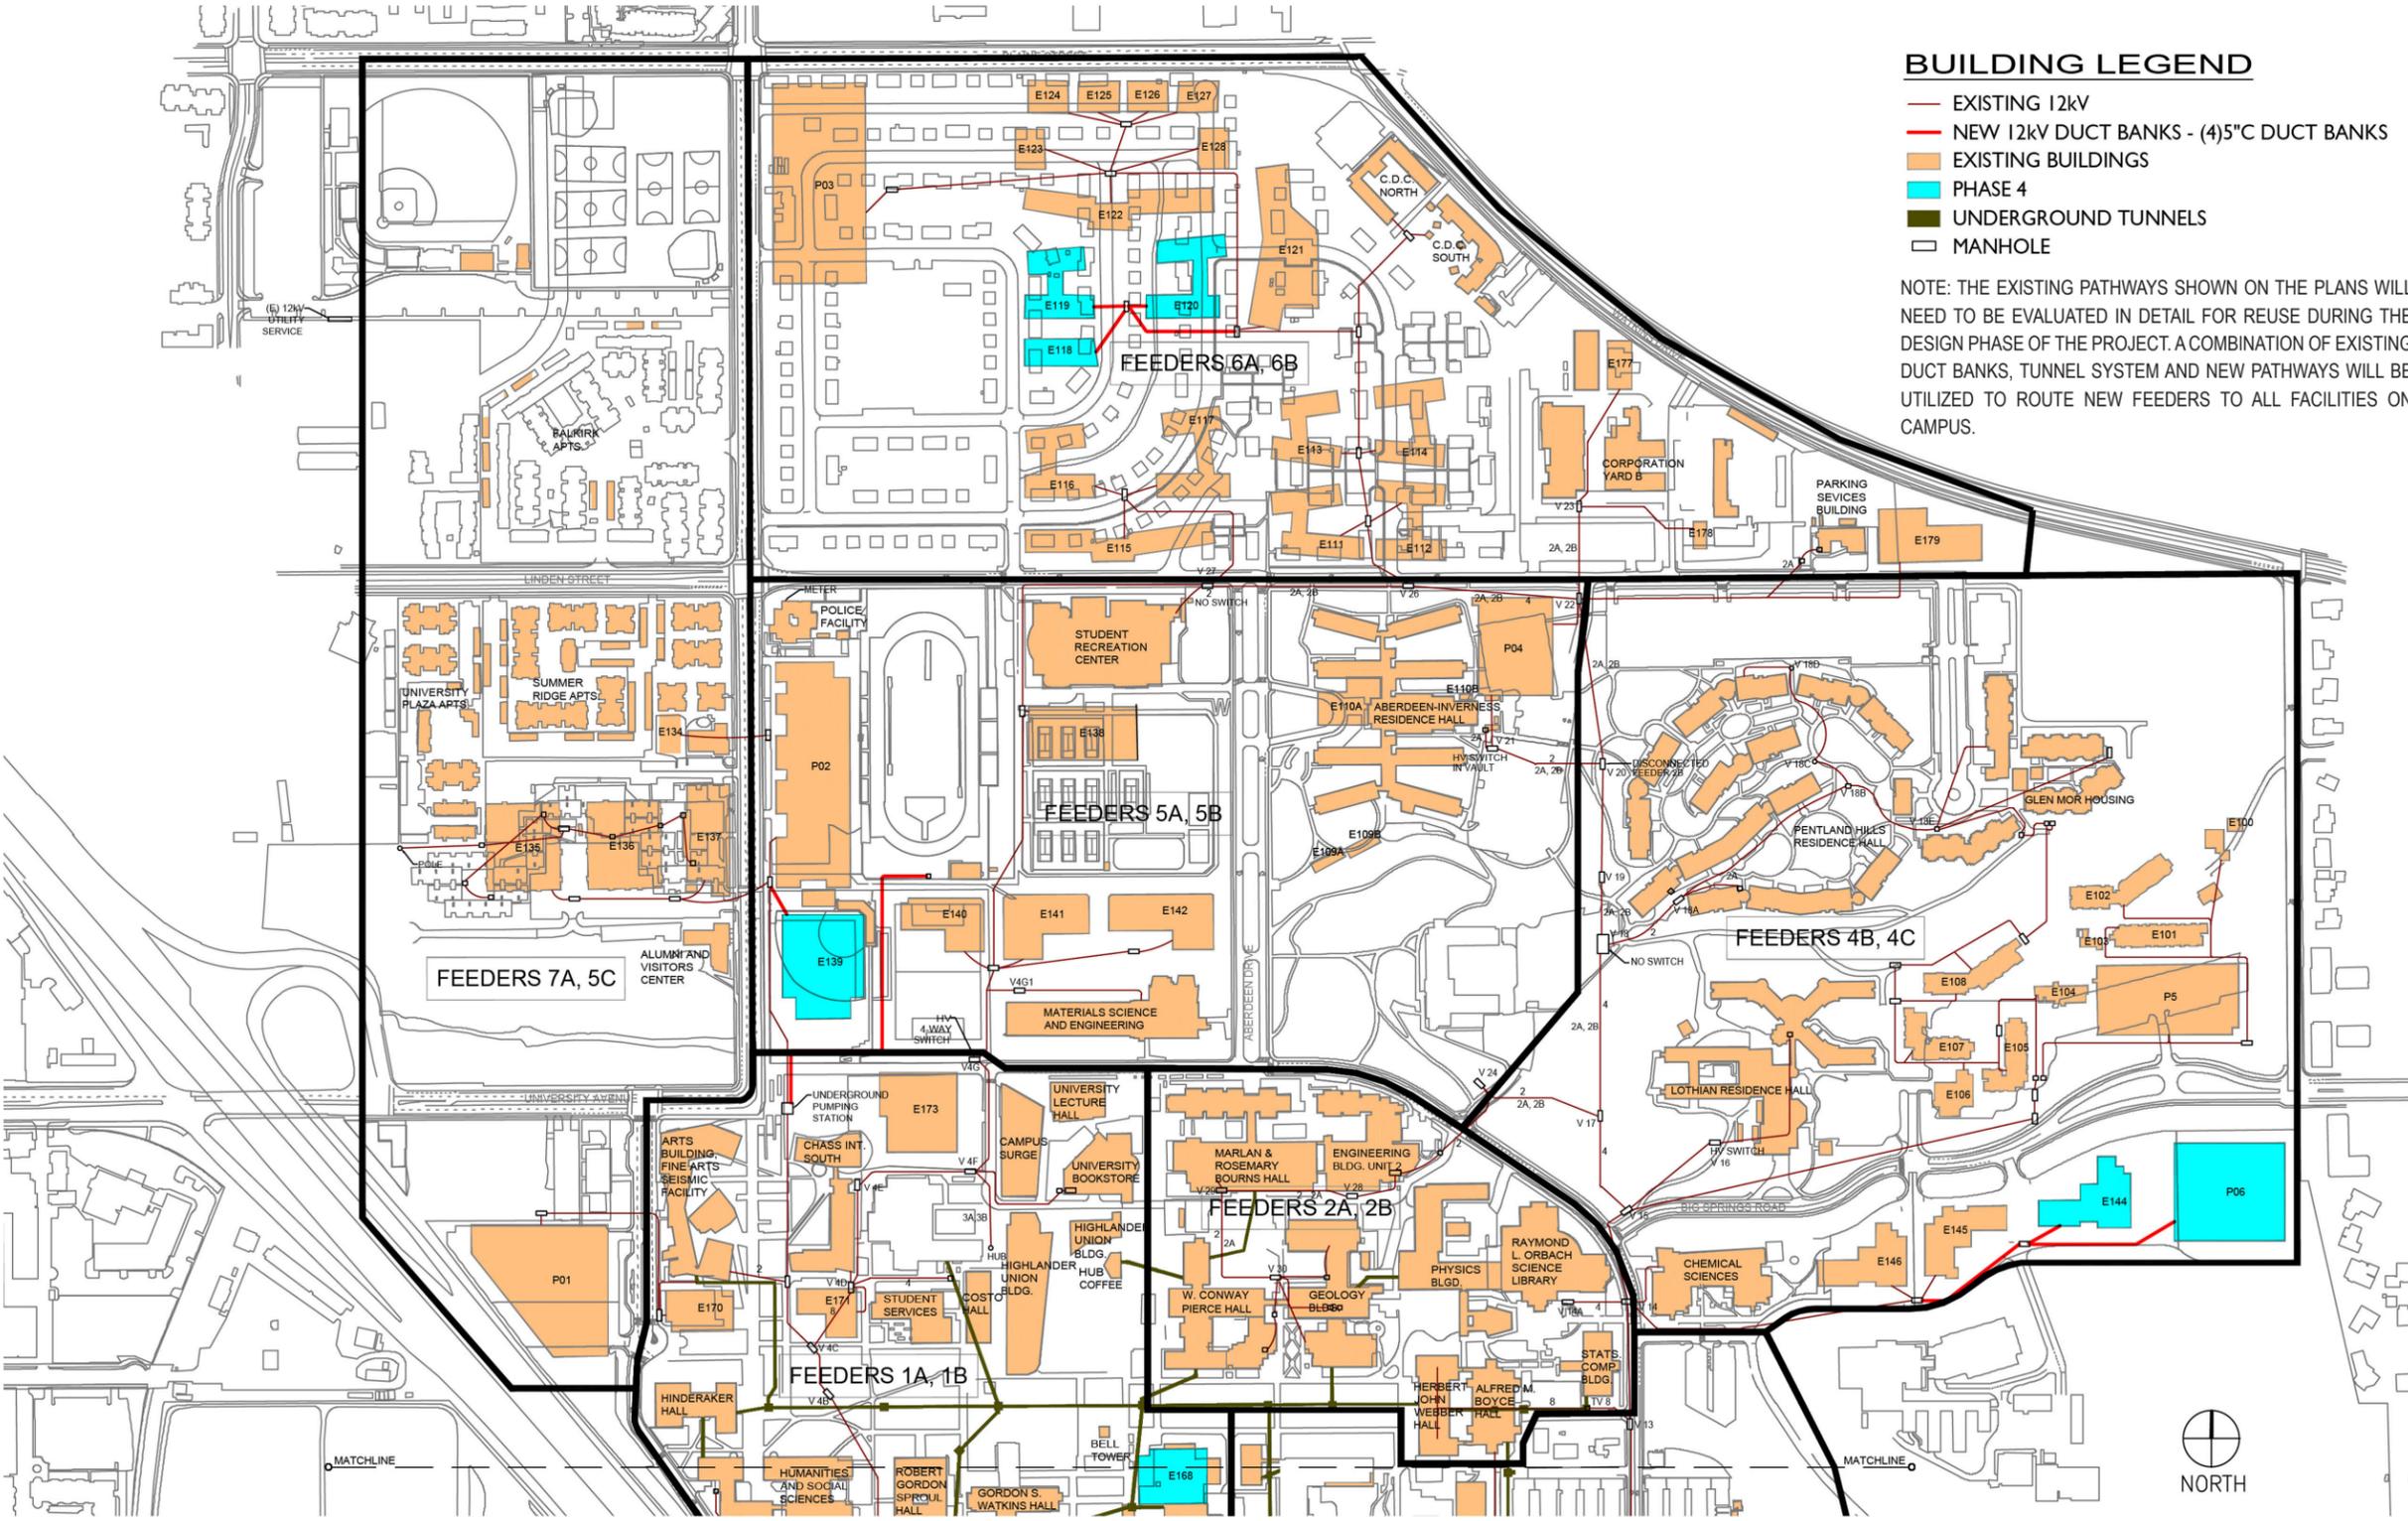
Phase 4 Buildings Electrical Site Plan–North
